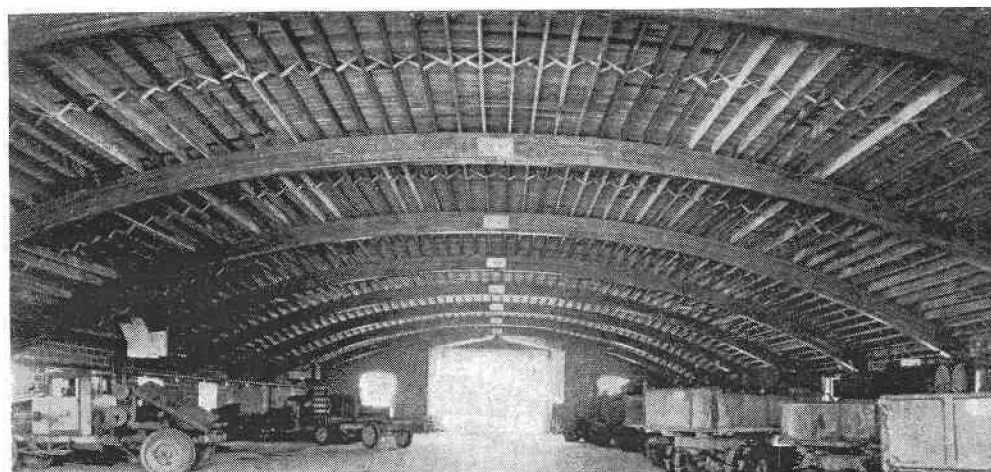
Service building at Forest Products Laboratory, 46 feet wide by 160 feet long, with nine arch spans spaced 16 feet. The five central spans (D-type) are glued laminated arches of rectangular cross section and constant width tapering from a maximum depth at the knee, near the junction of wall and roof, to lesser depths at the foundation and the roof peak. Next to each end span is a wooden arch of double I-section (C-type) composed of plywood webs, similarly tapering in depth, and glued laminated flanges of constant cross section. End spans are a trussed type framed with modern wood connectors. For drawings and dimensions of arches see figure 38.
